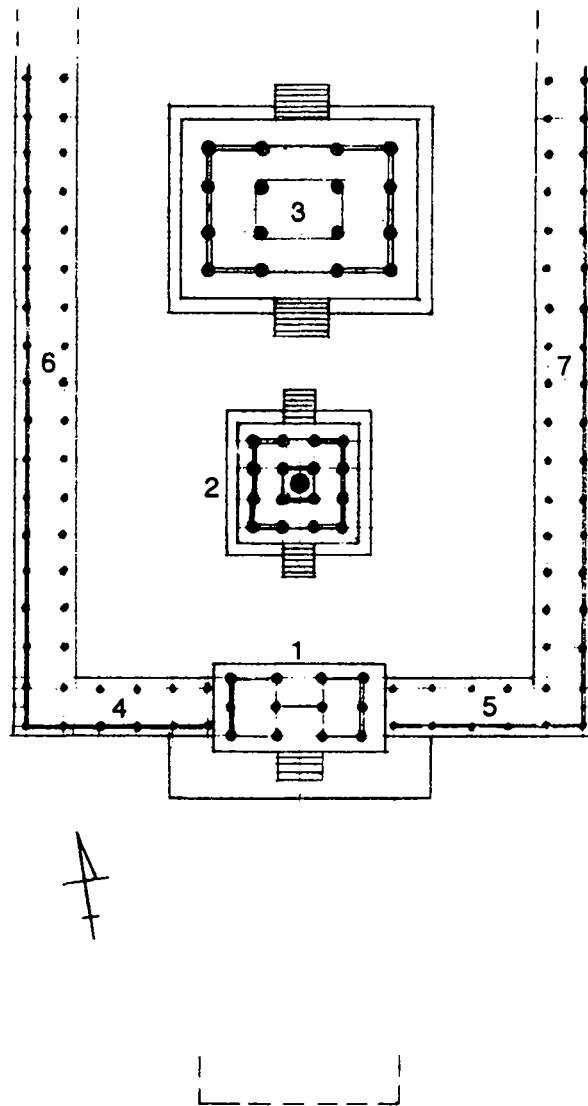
Reconstructed ground plan of Sŏ-bok-sa 西腹寺 서복사 according to the author with indication of the excavated structures (see table 14) (early 7th C. AD ?, scale: about 1 : 500) (drawing by the author)
